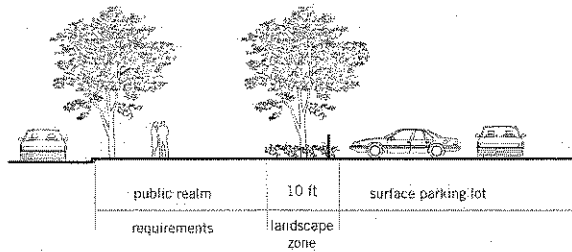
District Framework Plan - Public Realm Requirements
